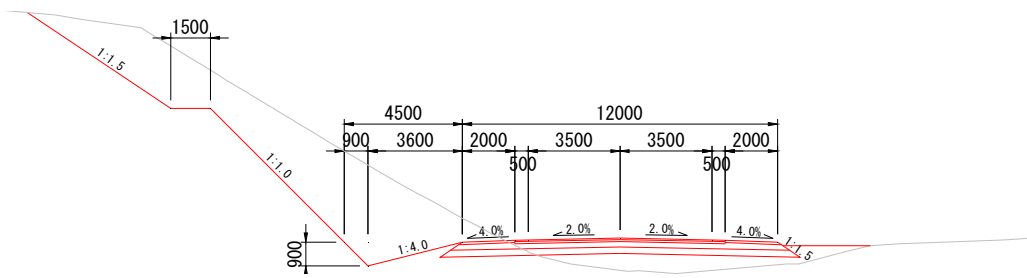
Approach Road Section on the Side of the Starting Point
